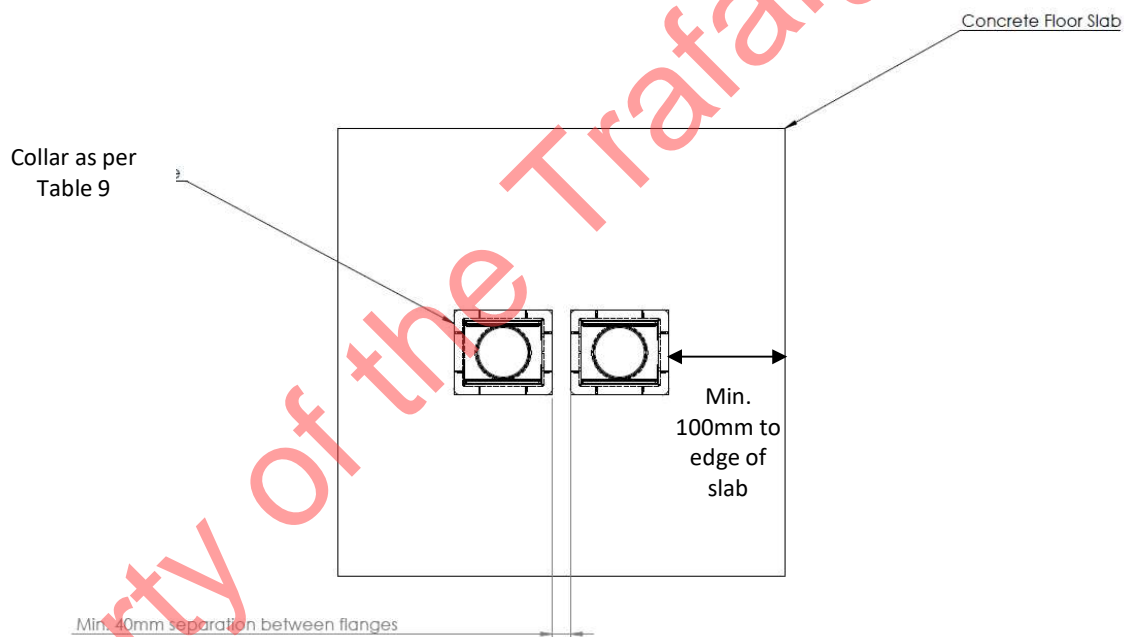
Spacing between adjacent penetrations confirmed to be 40mm (flange to flange)
